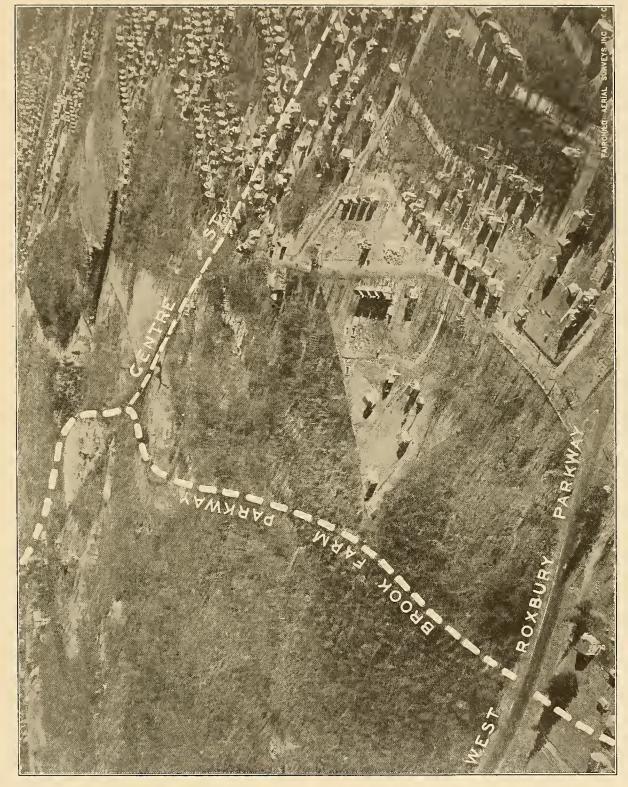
,—BROOK FARM PARKWAY (PROJECT 69) FROM CENTRE STREET TO WEST ROXBURY PARKWAY.
